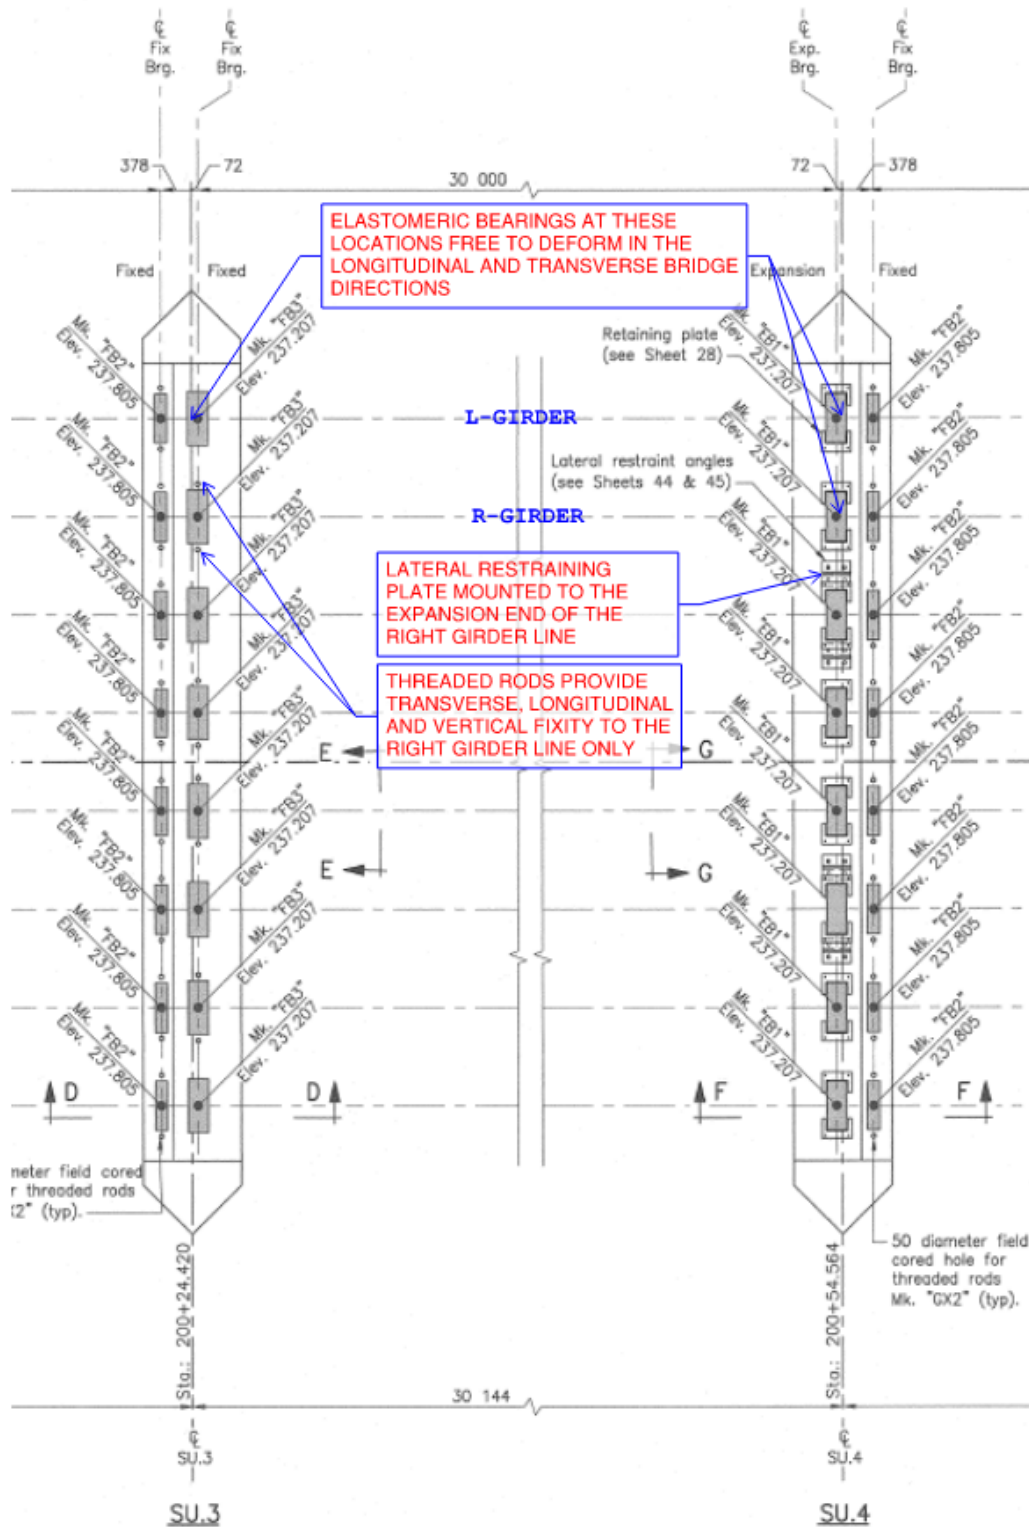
As-Constructed Girder Fixity Arrangement (WSP 2018)
